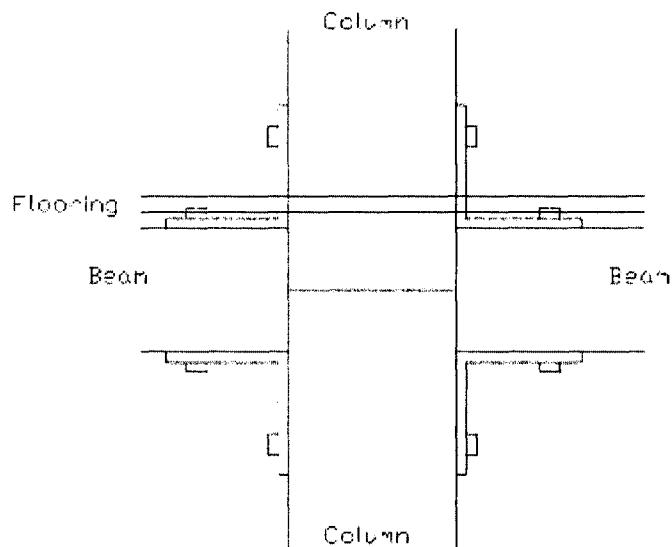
Beam to Column Steel Connections (courtesy of Simpson Strong-Tie Co.)
